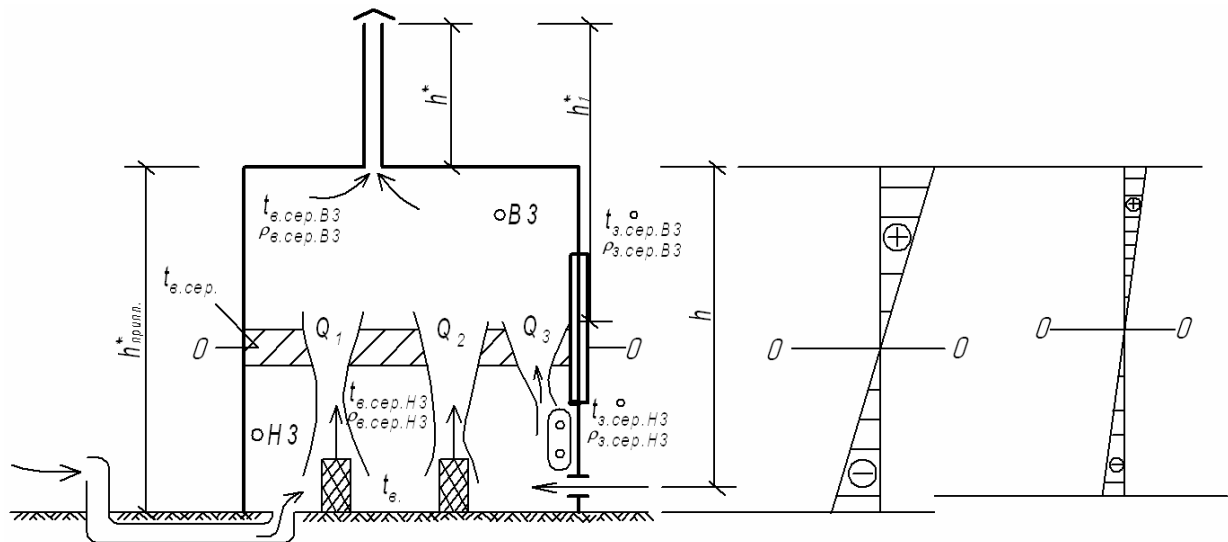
Scheme of system of pipeless and particular pipe thermal pressed ventilation of room with heat educing sources on a floor and epures of excessive pressure of thermal layered internal air
